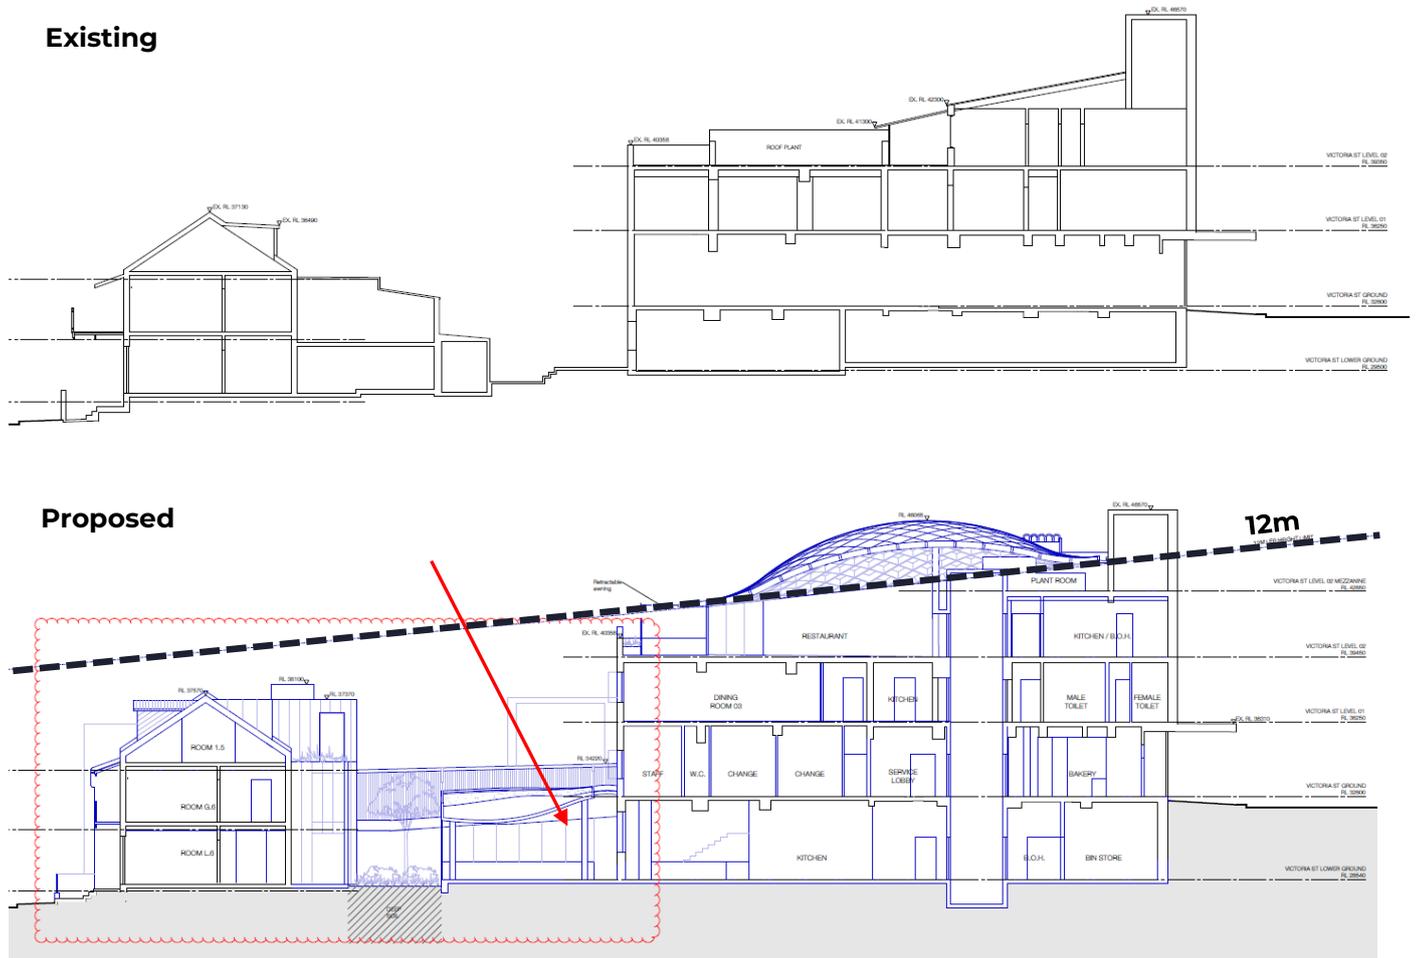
Existing and Proposed Building Section (through Piccadilly Hotel) – Annotated
